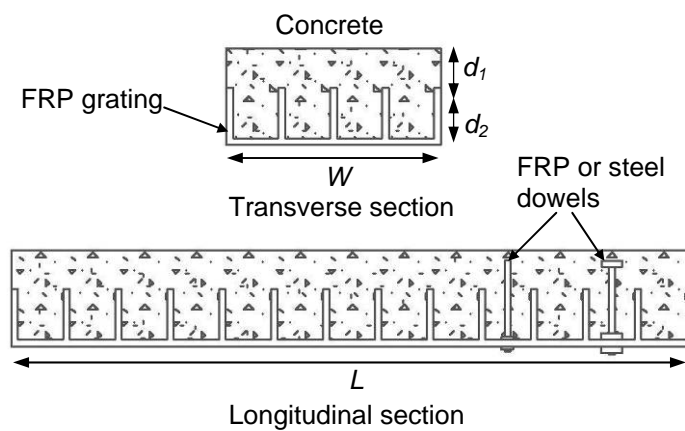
Transverse and longitudinal cut-through views of beam specimens (Larralde, 1992)
